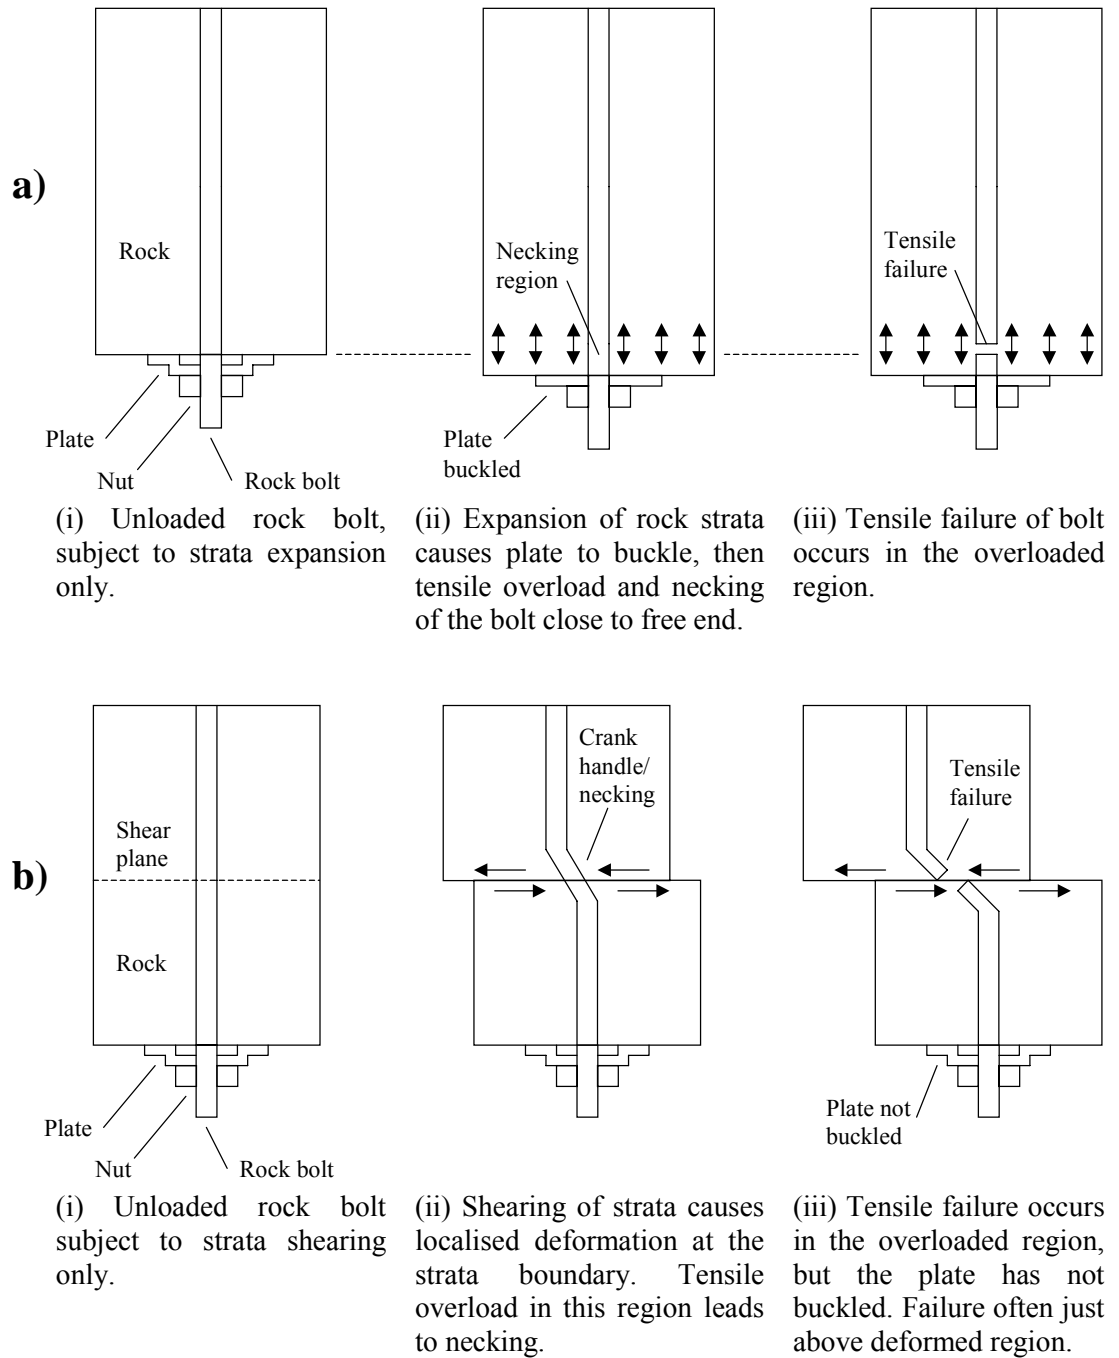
Rock bolt failure mechanisms, (a) due to strata expansion, and (b) due to strata shearing.
